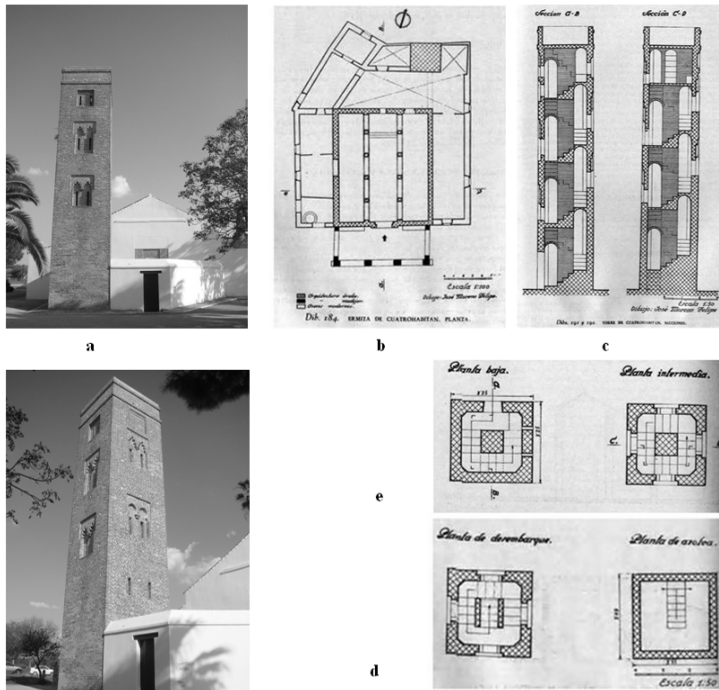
(a) General frontal view, and north and west façades; (b) Church plan section; (c) tower longitudinal section; (d) tower plan section. (Source: Catálogo arqueológico de la provincia de Sevilla.)
